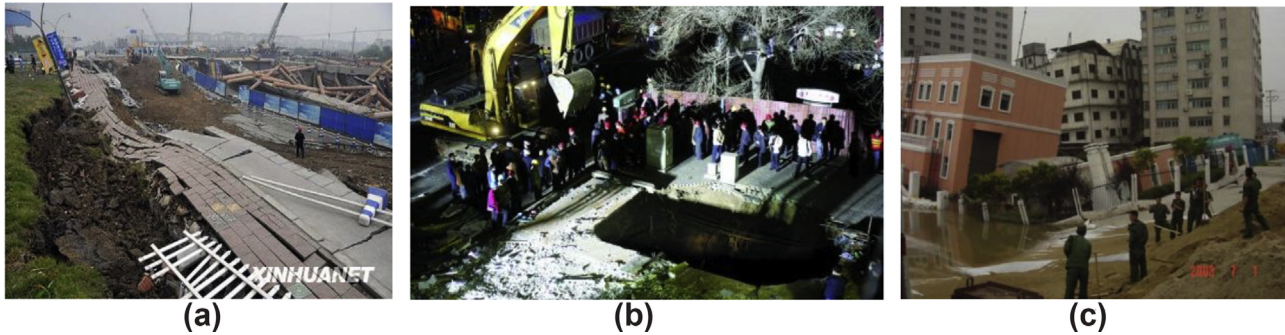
Disasters occurring in underground space development: (a) Hangzhou metro pit collapse, (b) Beijing metro collapse, and (c) collapse accident in Shanghai Subway Line 4.
